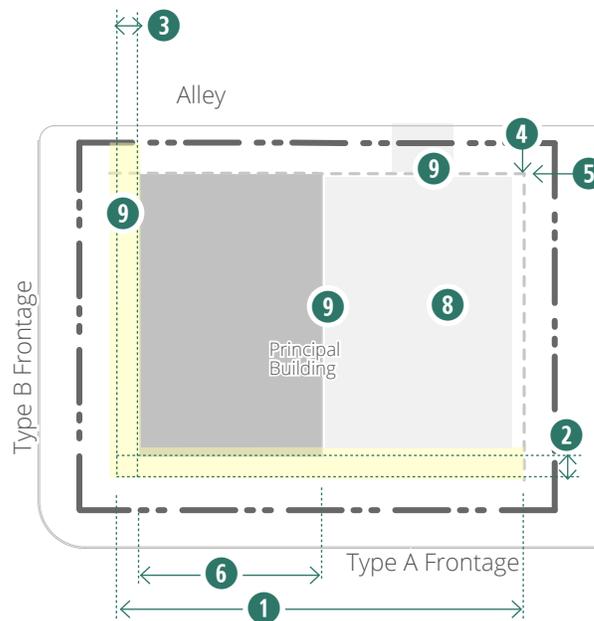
(5). Commercial Storefront Building Plan: Building Siting Requirements
